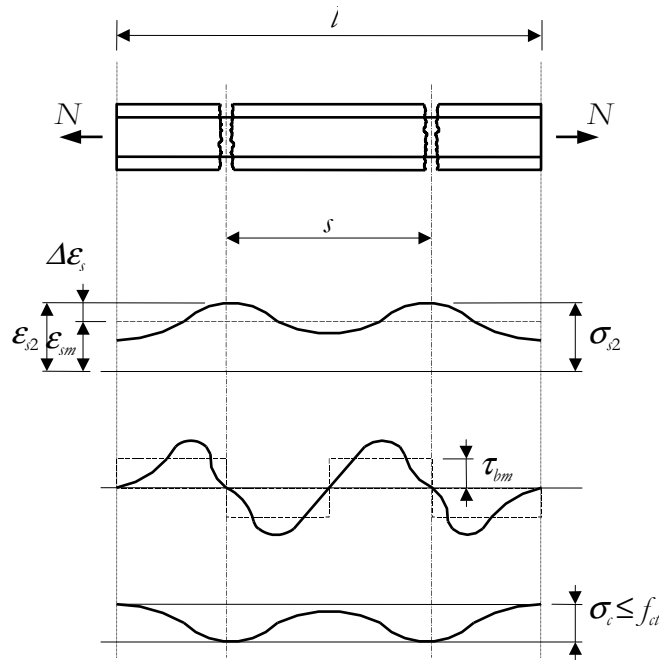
Cracking mechanism of a concrete member (CEB 1983).
